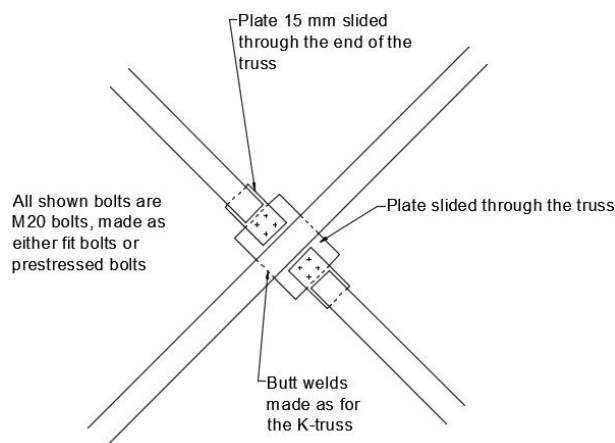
Solution for the connection between the diagonal trusses in the X-shaped truss system
